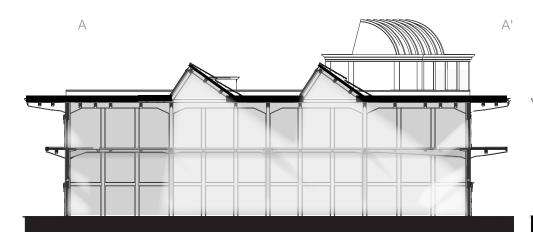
Plan view of daylight in compartment after installing new rooflight, source: own image
